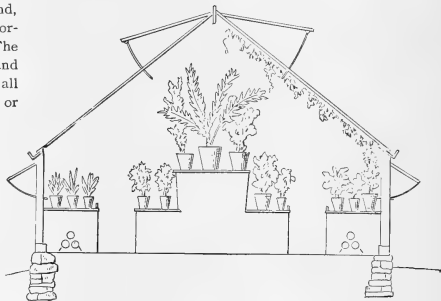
CROSS-SECTION OF AMATEUR GREENHOUSE.
